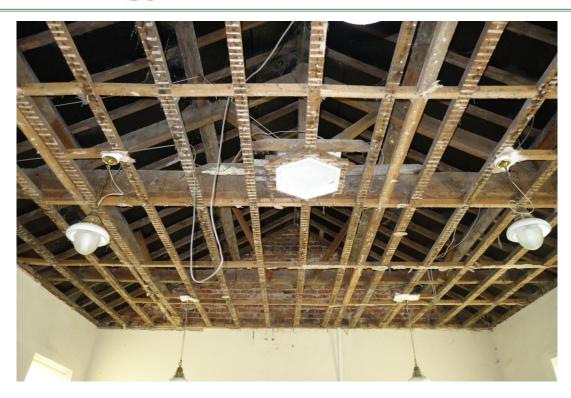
Views looking SE showing detail of roof structure with kingpost roof and hexagonal ceiling hatch
